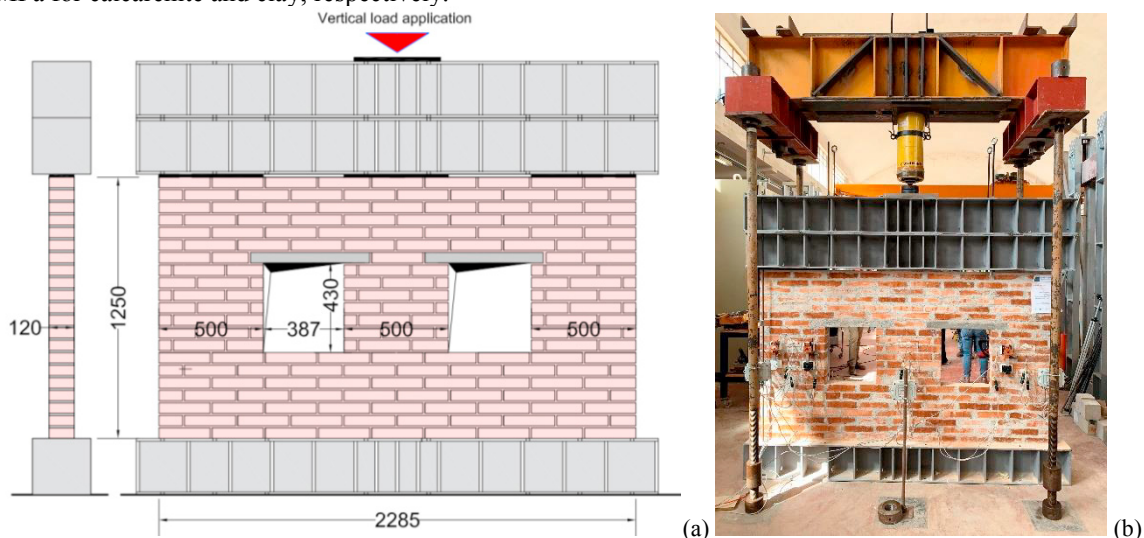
(a) Design details of a specimen; (b) Test setup picture for the clay brick masonry specimen.
